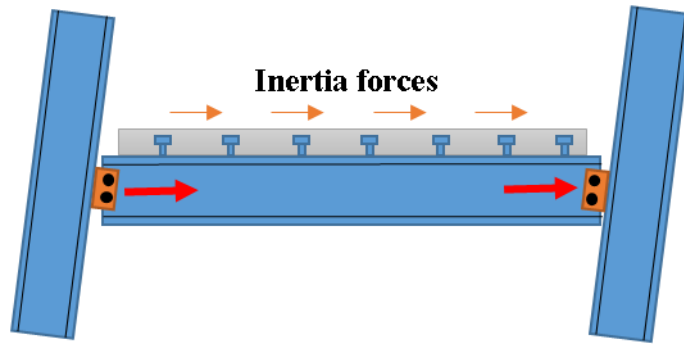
Beam-column connection axial force when a gap is provided around the column
